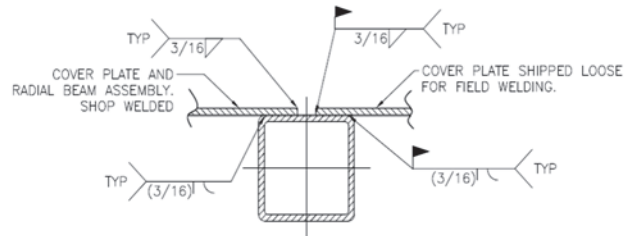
Typical Weld Detail for Radial Beam Connections
